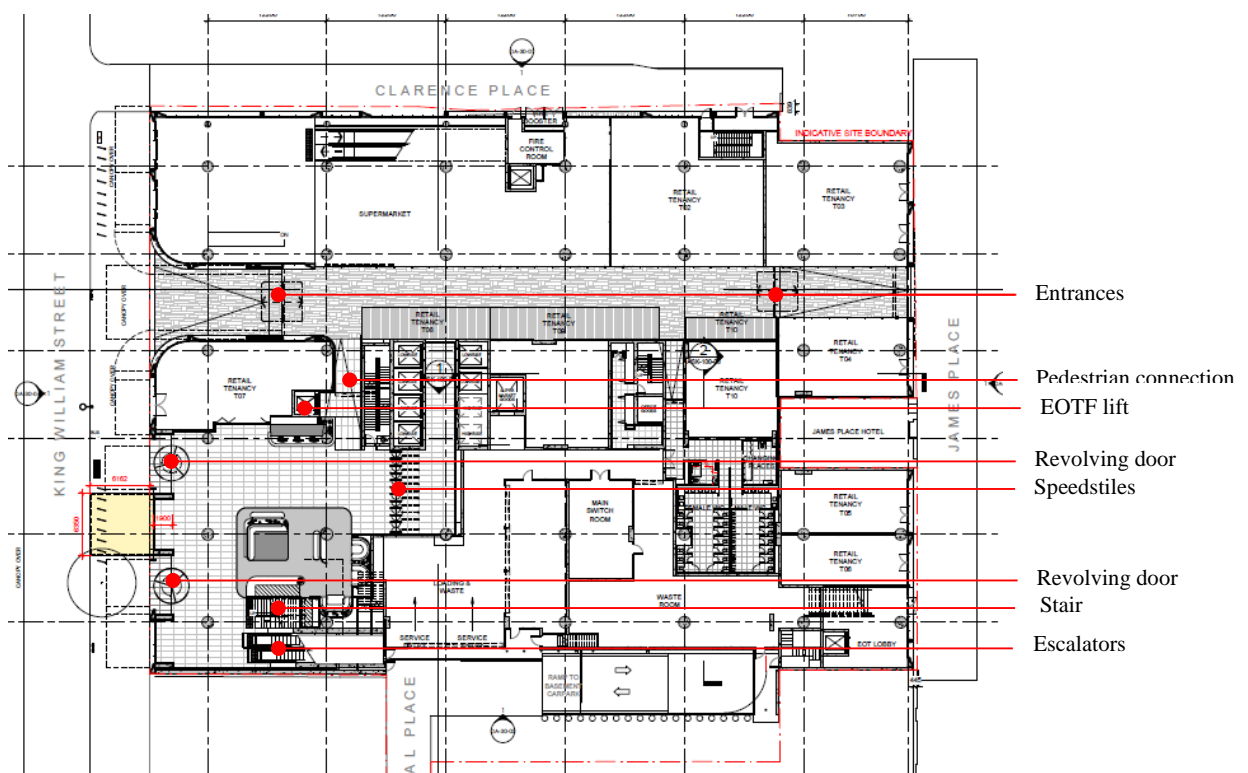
Ground Floor GA Plan (dated 07/05/20)
